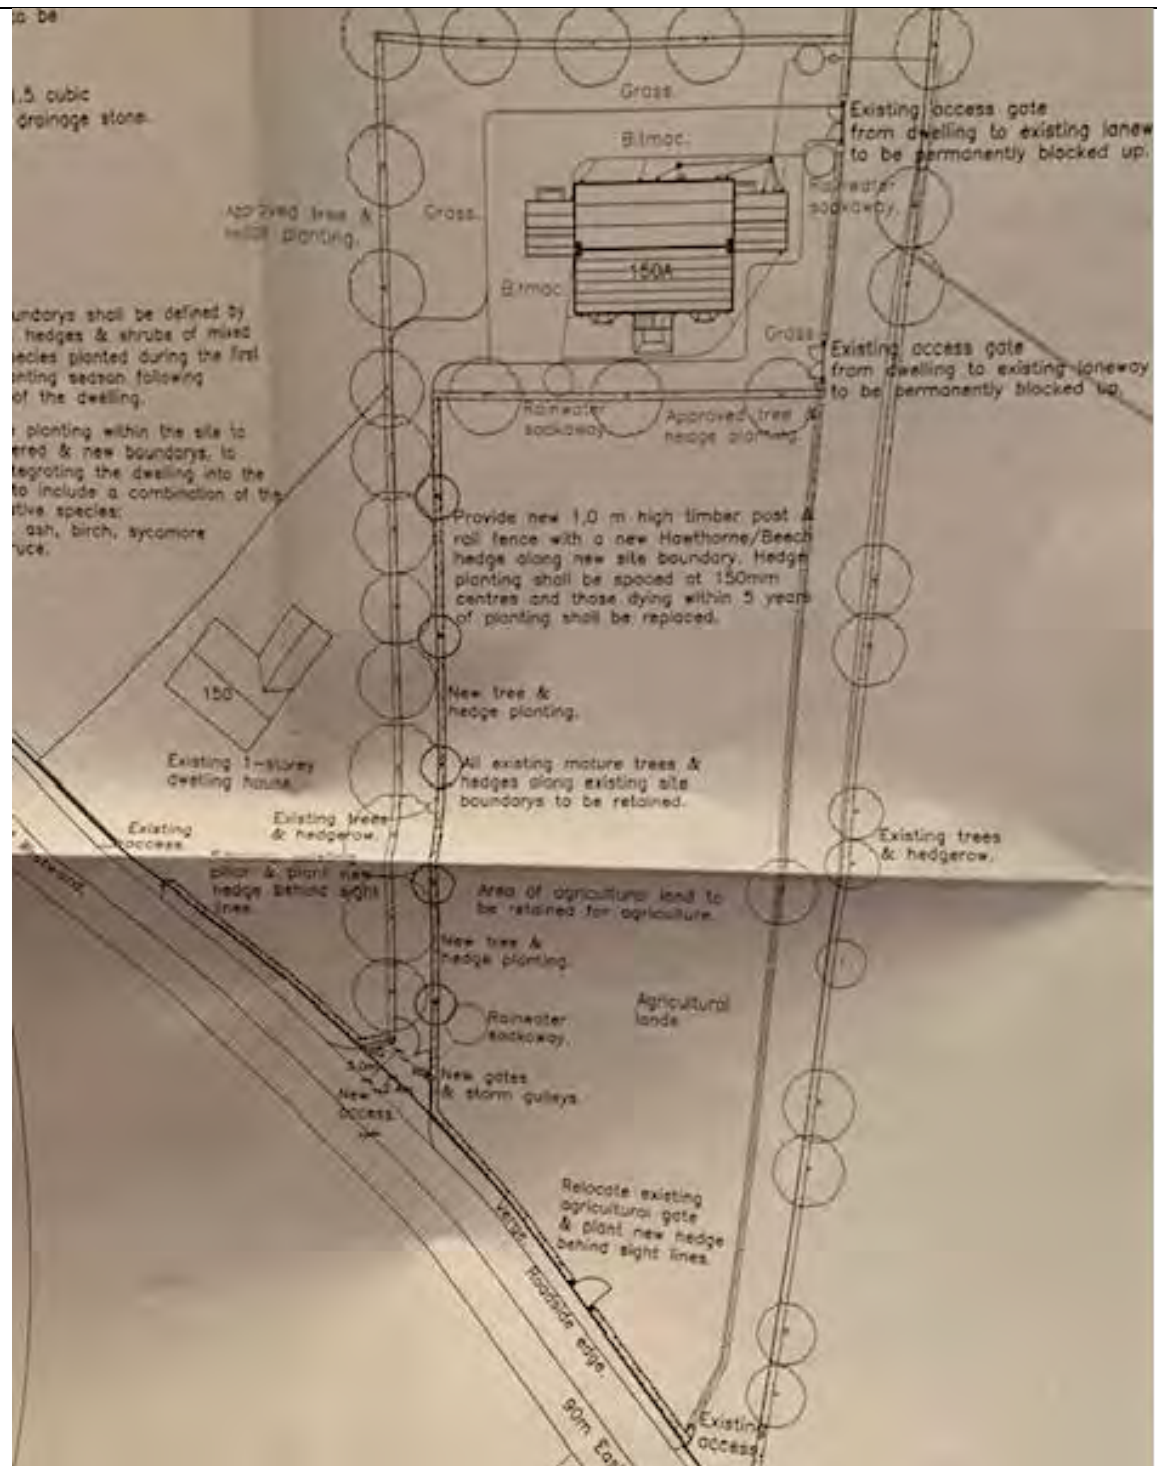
Block plan granted under planning application I/2007/0593/F showing land to front of dwelling to be retained for agriculture.
